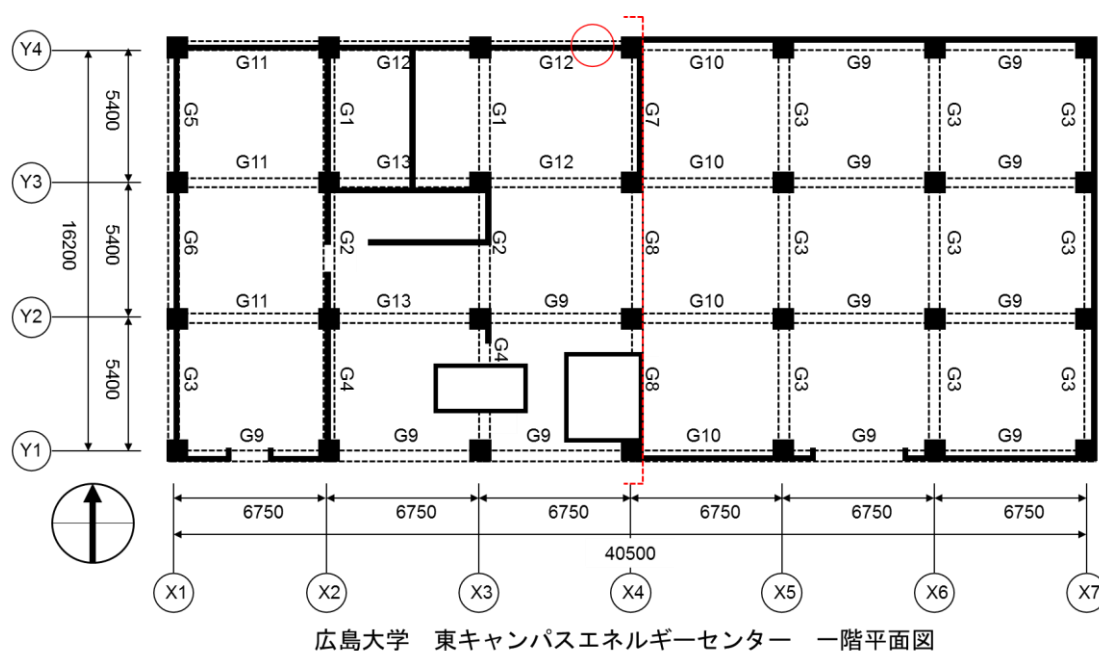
Simplified Chart of First Floor Plan of Object Structure
